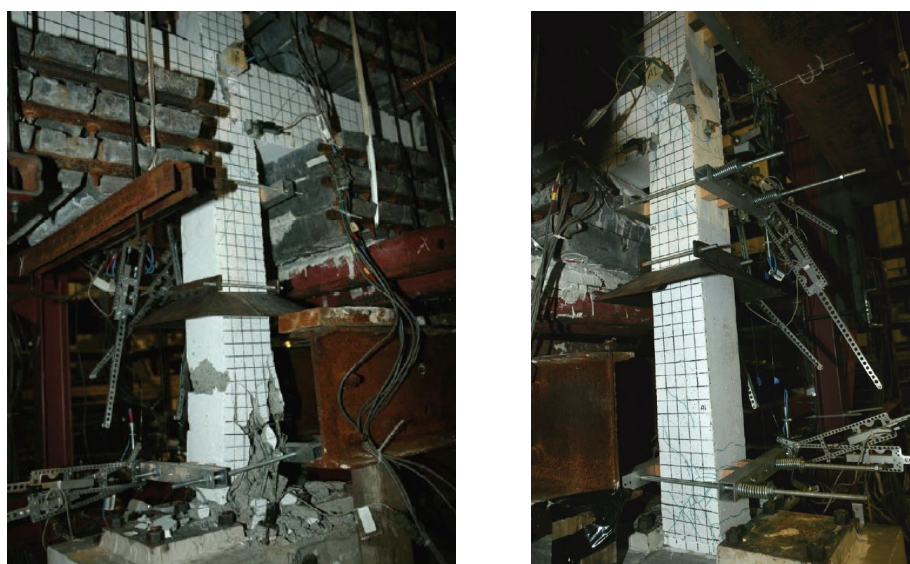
Column B1 (left) and Column A1 (right) after Dynamic Test 1 at base.
